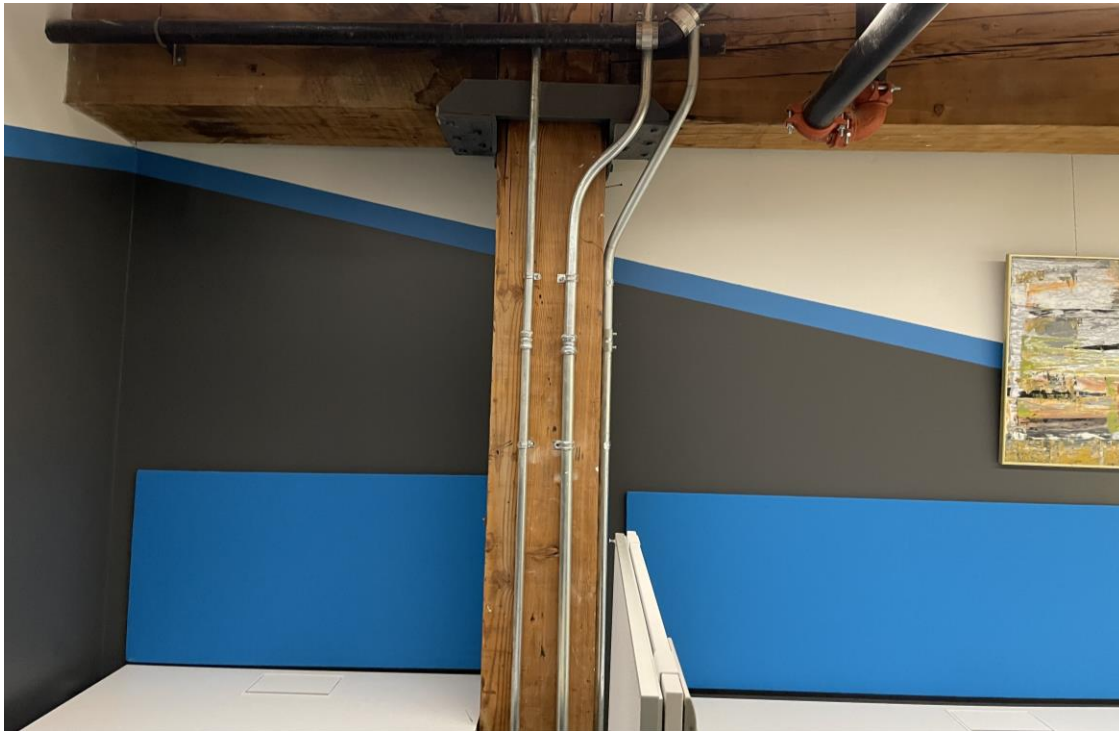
View of the basement level of 339 Queen Street East with beam timber frame construction (Heritage Planning, 2026).
